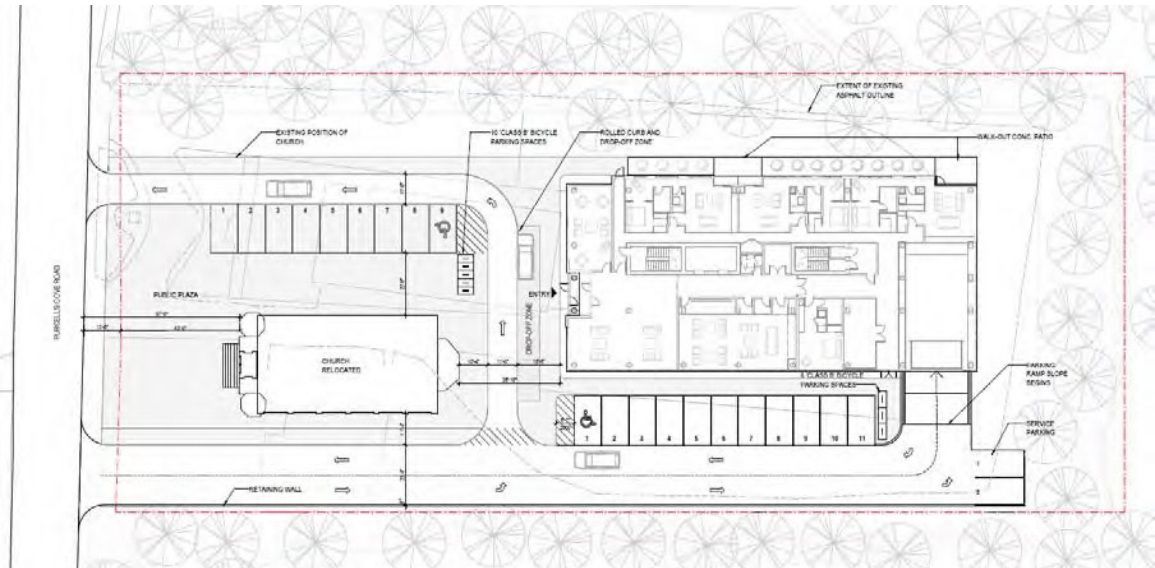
Proposed High-Rise Apartment Building at 1102 Purcells Cove Road
